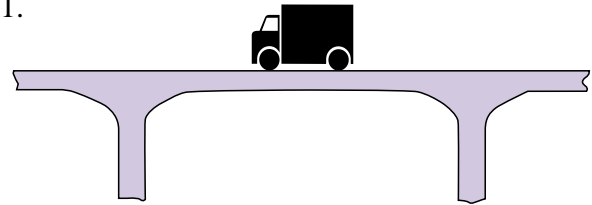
A beam is a structural member designed to resist transverse loads.
